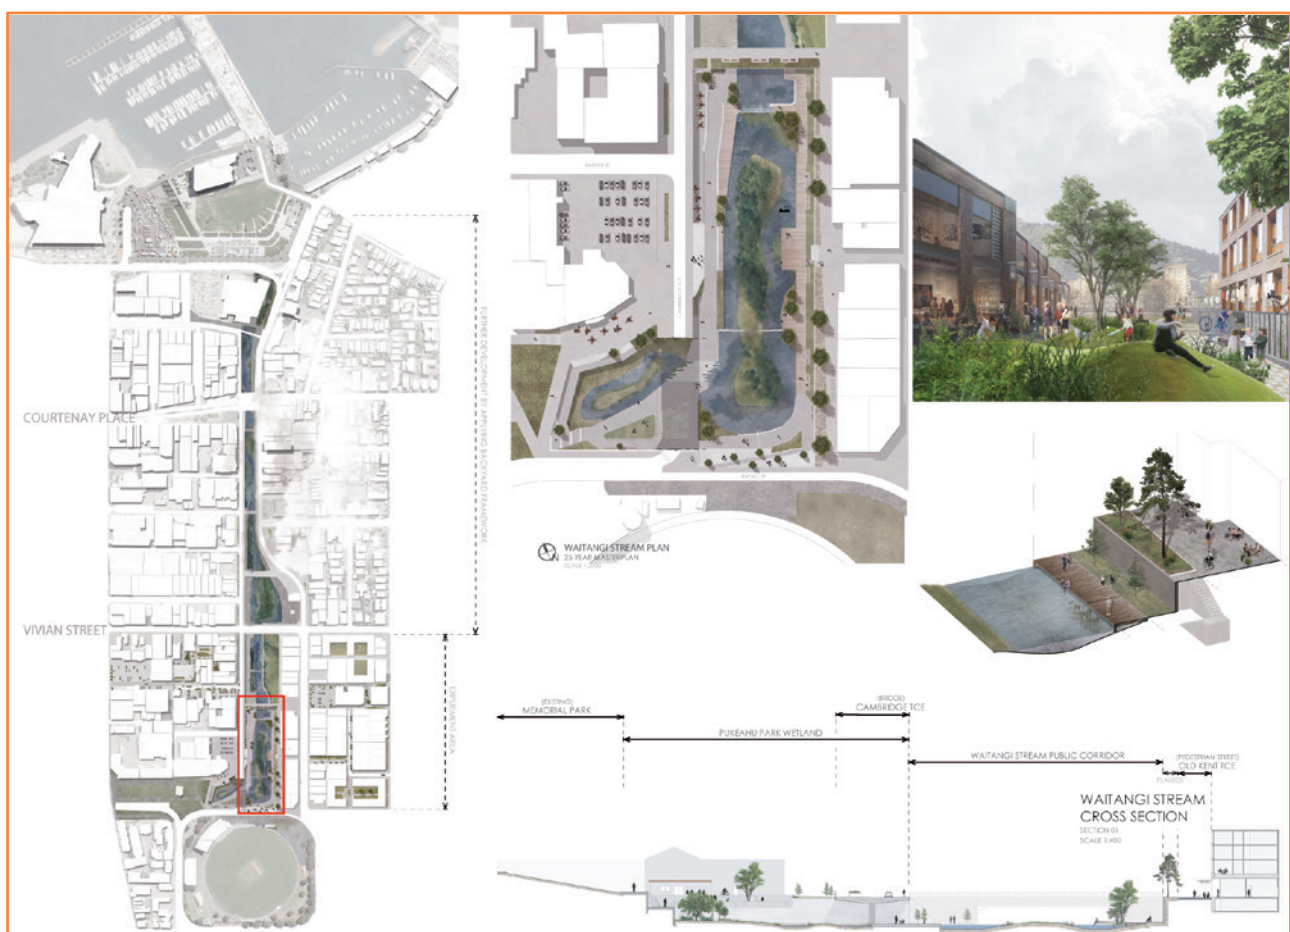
Design-led research exploration for Kent and Cambridge Terrace: masterplan, section, axonometric detail, and render
